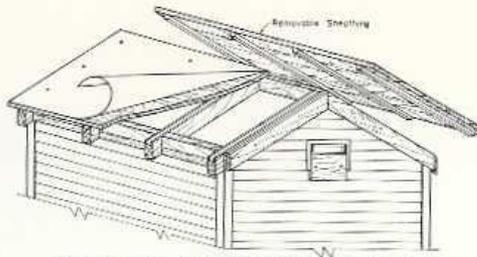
CONSTRUCTION DETAILS OF ATTIC FOR ATTIC VENTILATION TESTS
